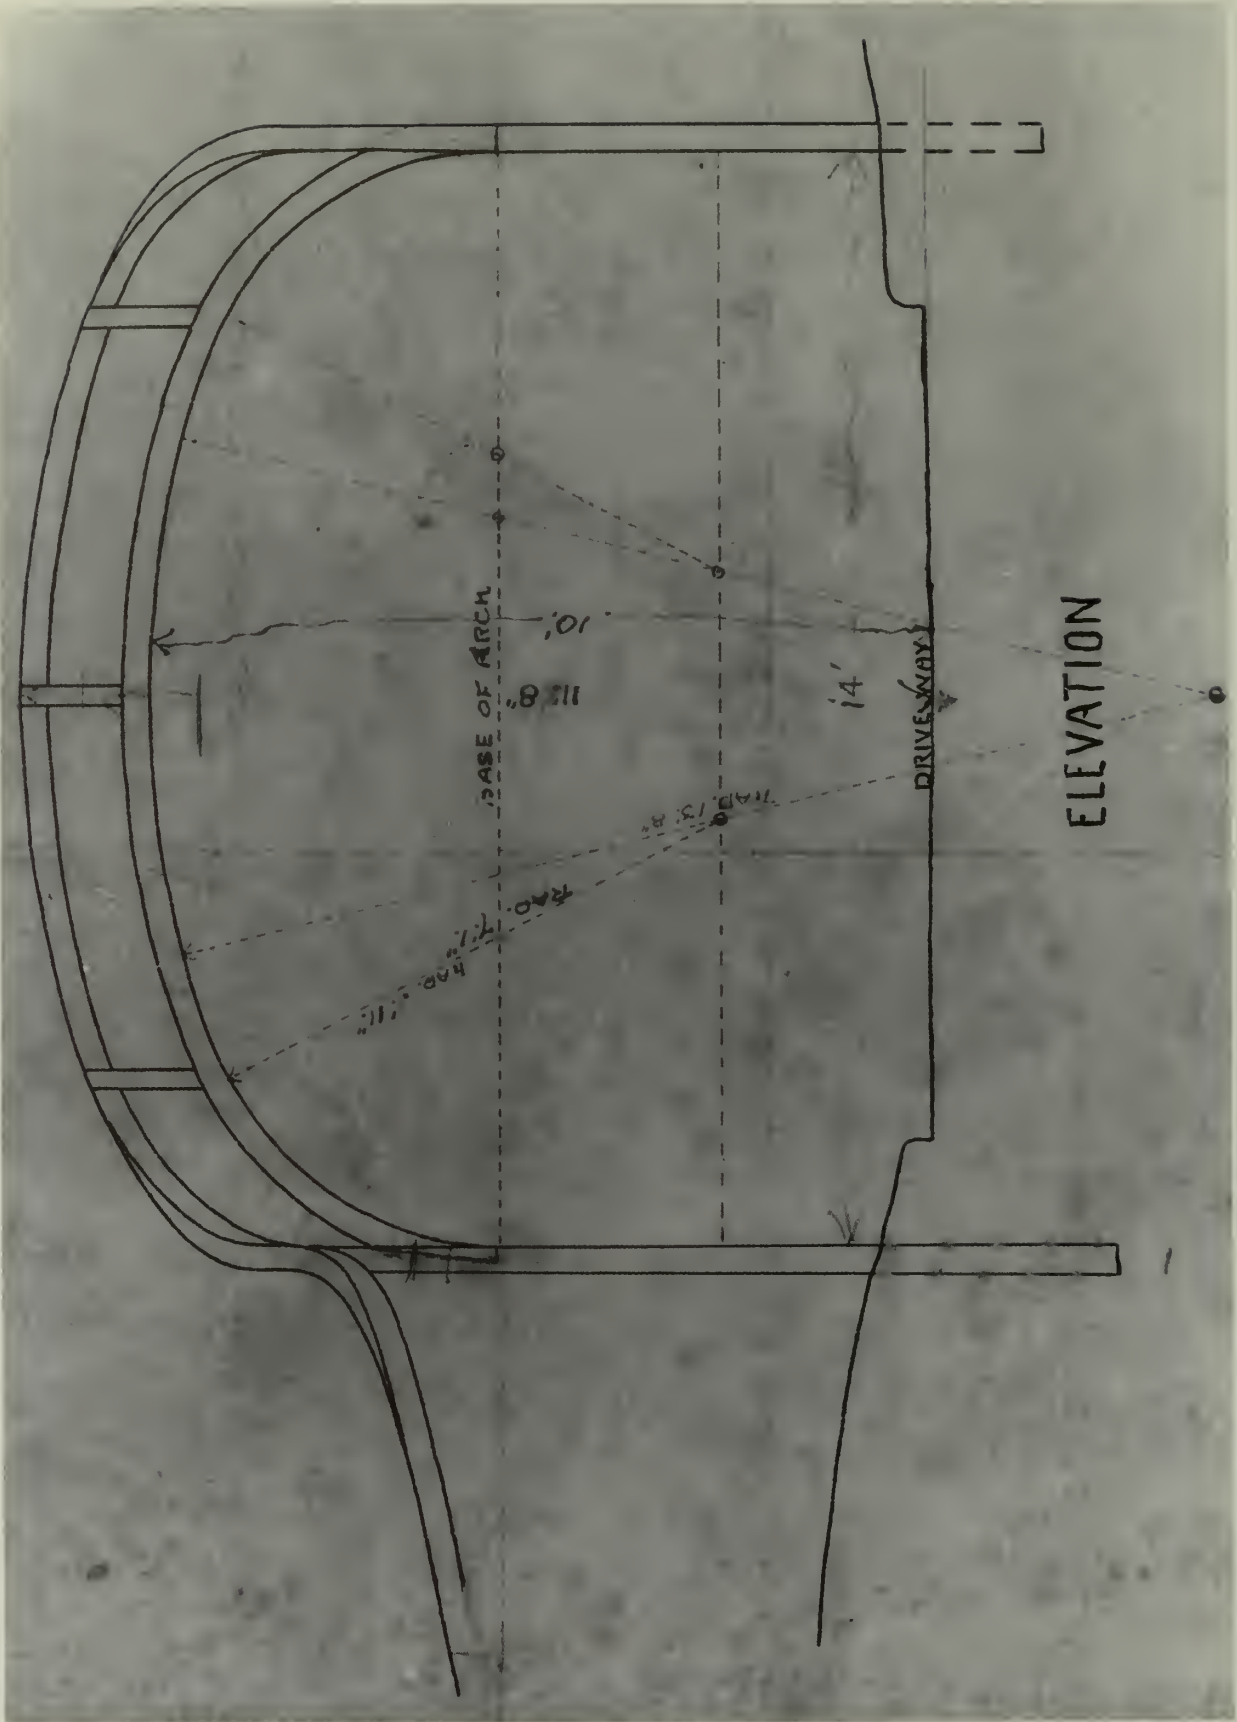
Spruce pole fence: elevation of front driveway arch, circa 1883.
